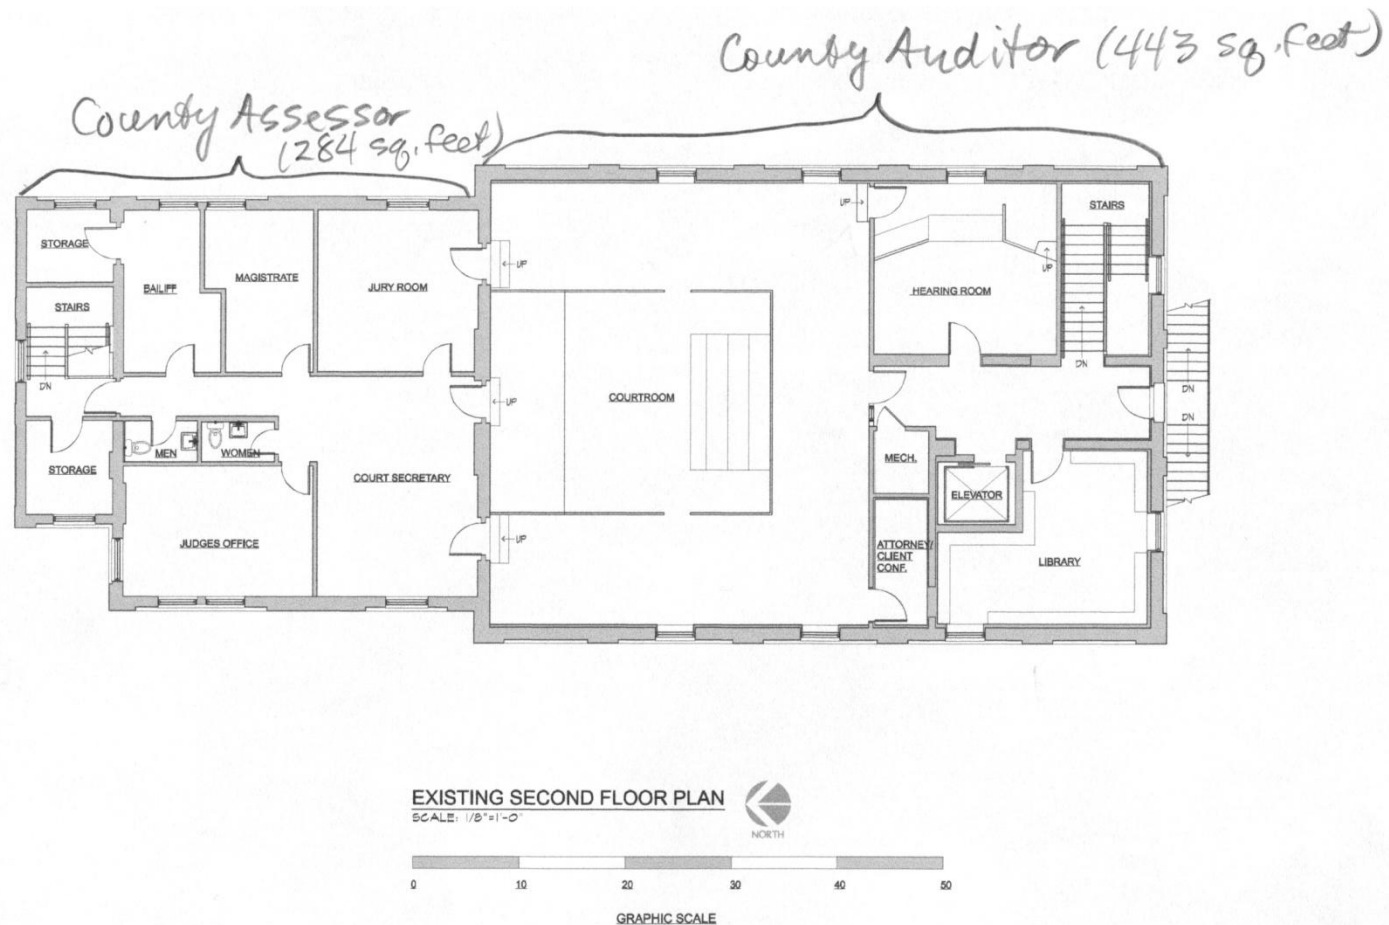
Existing second floor plan of Courthouse, showing space available for County Auditor and Assessor.
